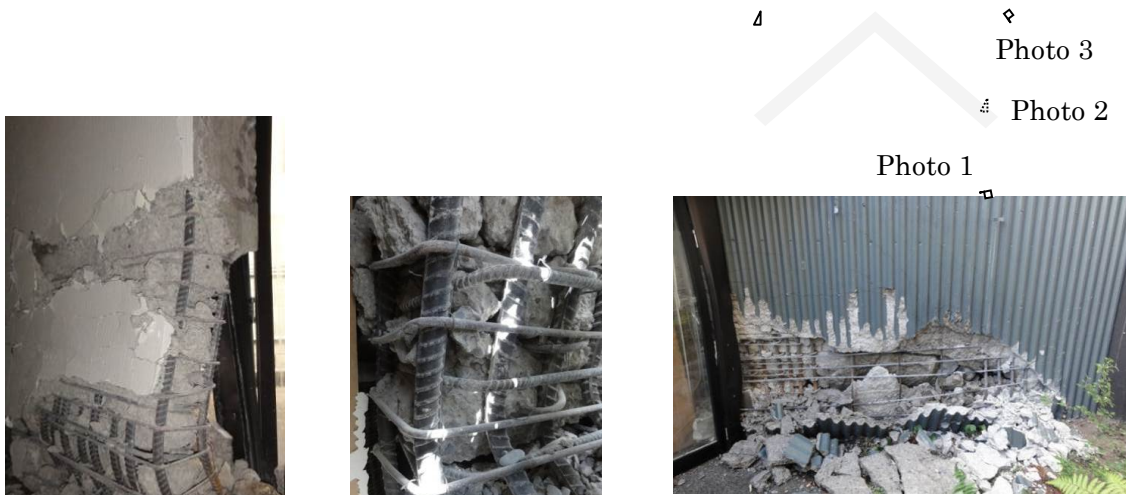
Seven-storey 1980s office block with compression failure of the V-shaped RC shear wall.
